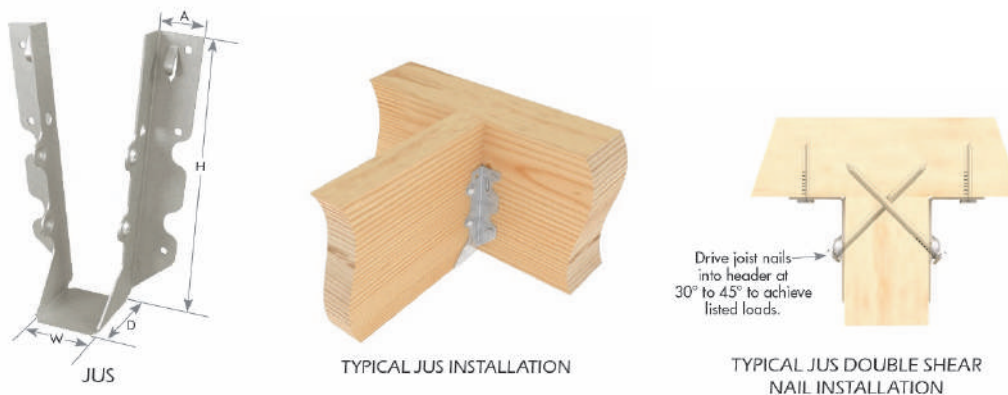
JUS SLANT NAIL JOIST HANGER
